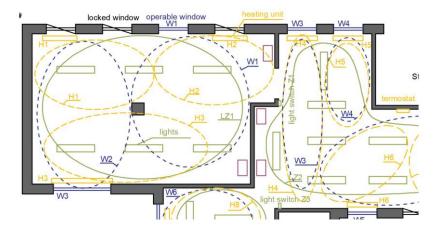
Students' concept 1: floor plan gym (Do Carmo and Vidal 2017)
